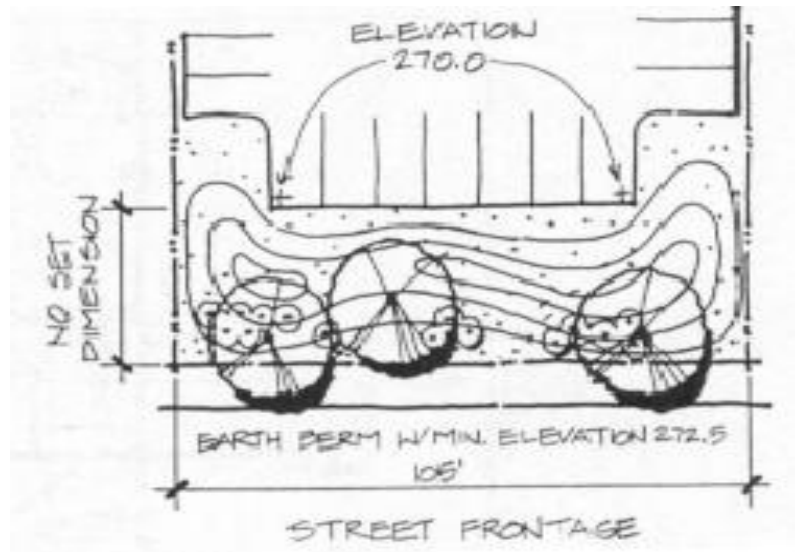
Parking Lot Landscaped Strip, Option 2
